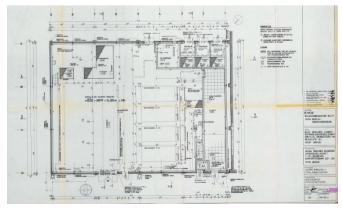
Plan of the Test Building (Source - HTW Berlin)
